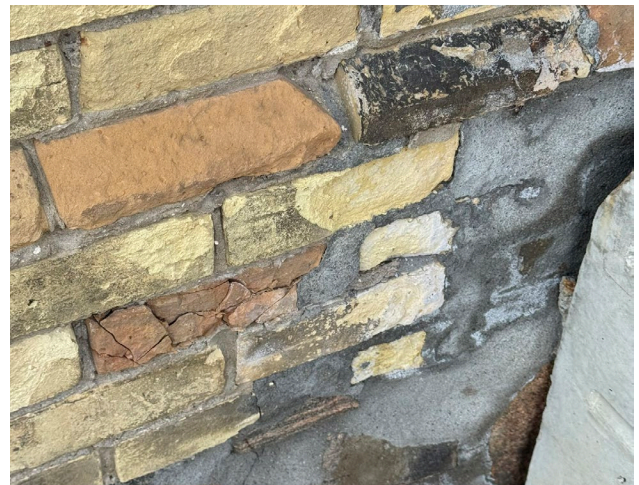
Localized brick spalling and mortar deterioration at base
